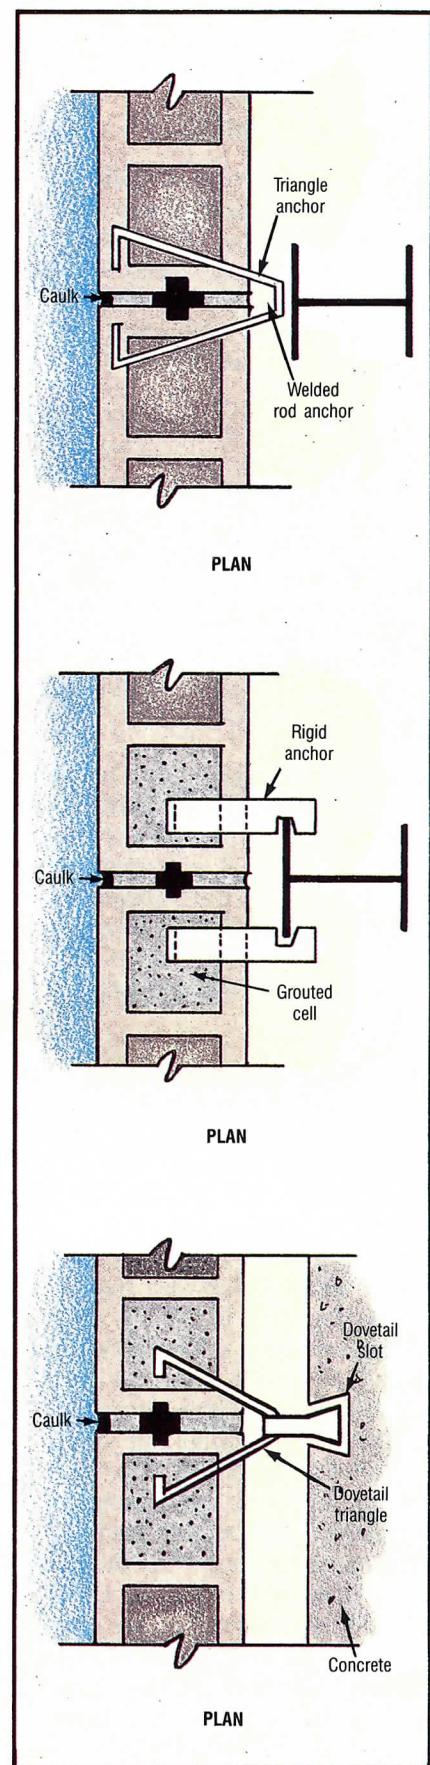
Three ways of constructing control joints at supports. Wire ties can be extended to the outside face shell or embedded in the grout.
